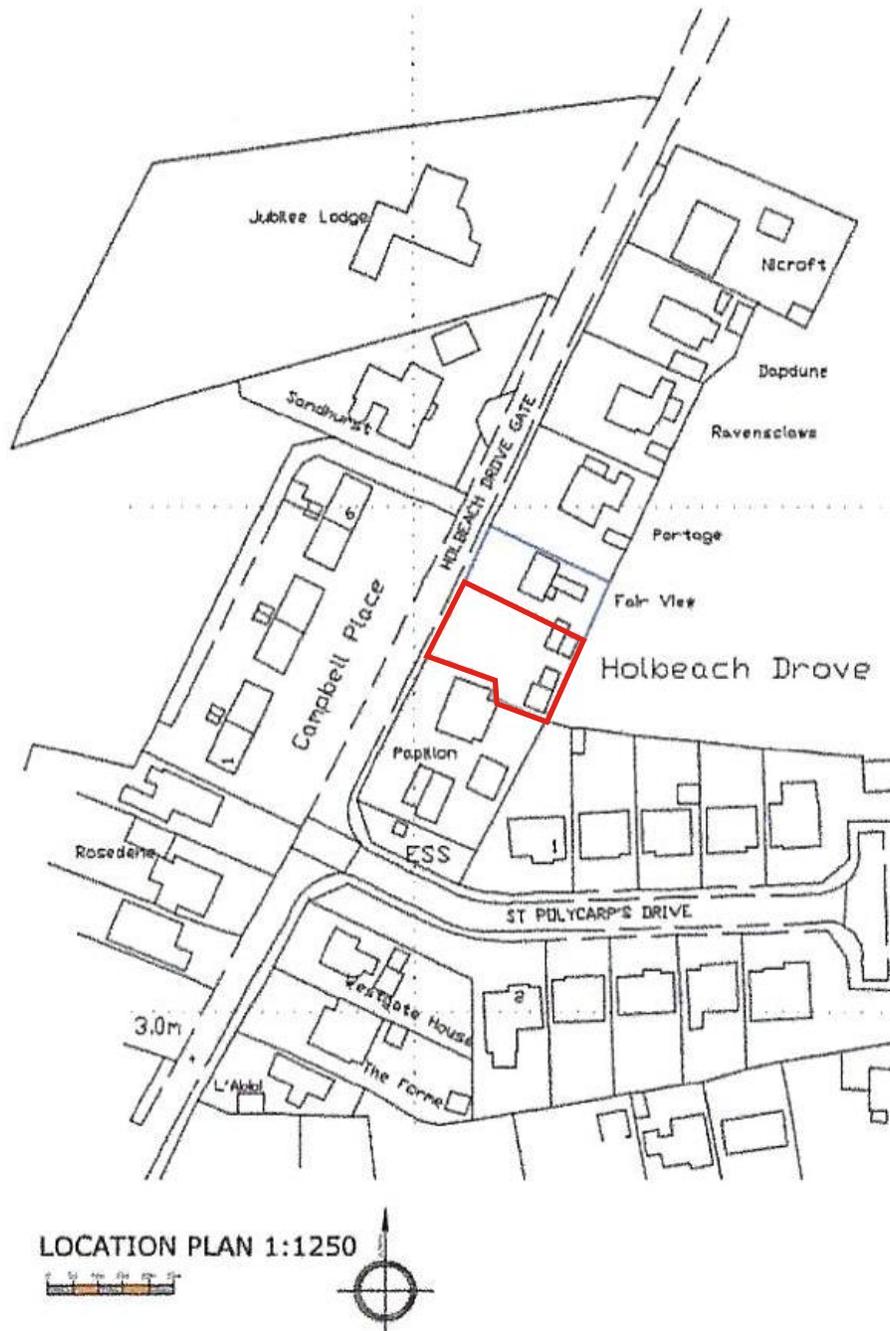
Site location showing the existing site layout at an original scale of 1:1,250, (extract from Architects plan). The site is shown outlined in red.
